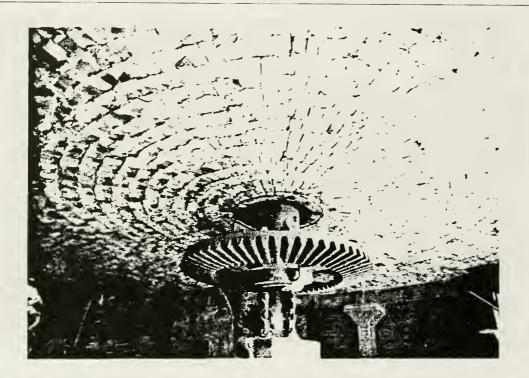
Arsenic plant (structure #59) showing detail of brick floor at the bottom of the McDougall roaster.
